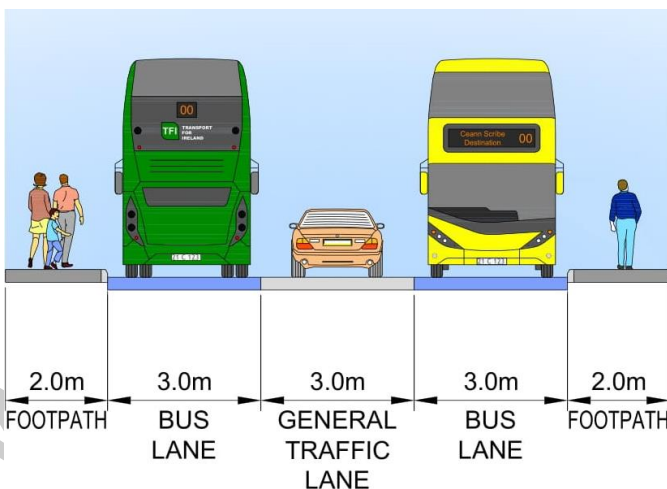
Section 2, Proposed Option 4c – Cross Section B-B
